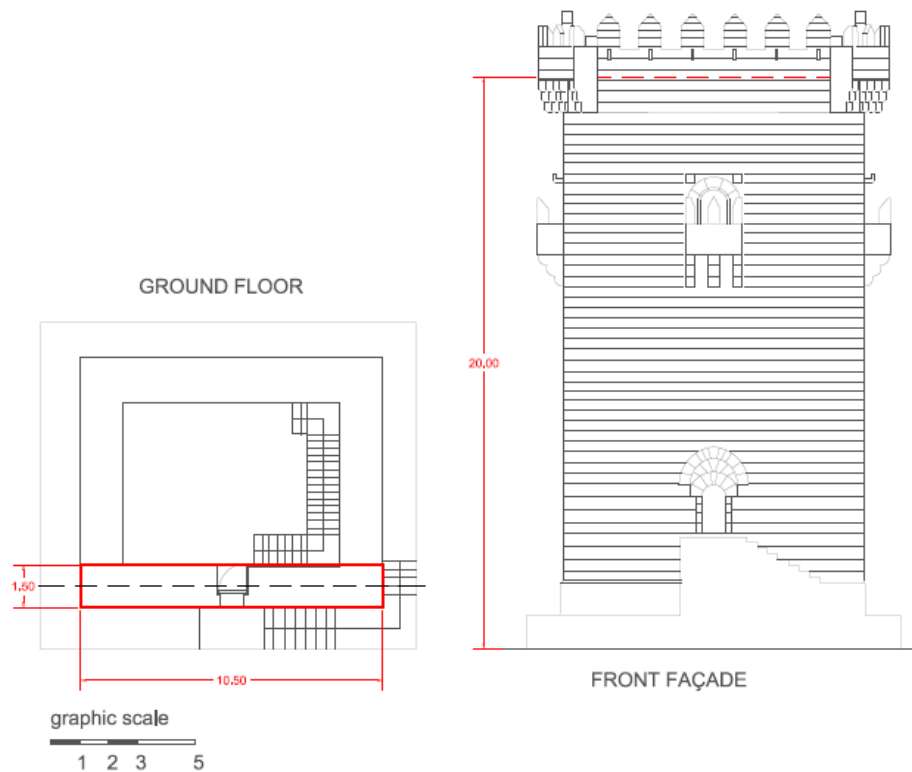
Plan and section view of Quintela Tower showing the wall that will be verified.
